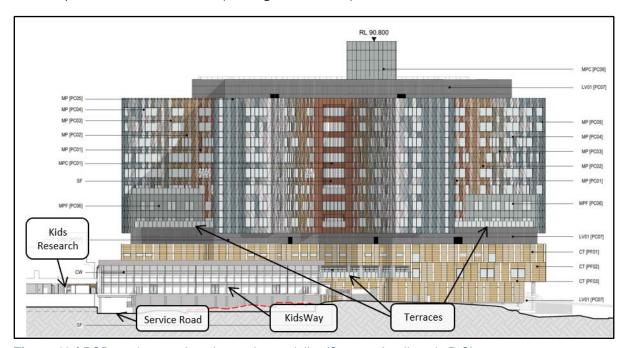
| PSB north-east elevation and materiality (Source: Applicant's RtS)
